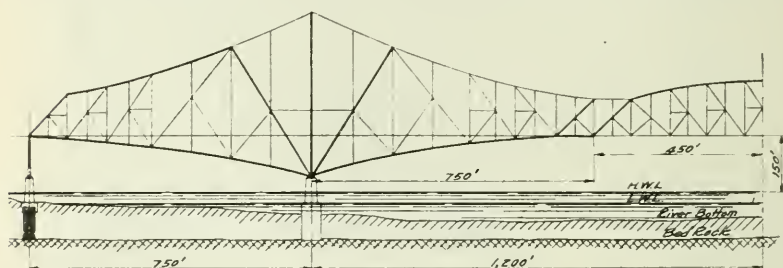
Layout for 2,400-foot Span Cantilever Railway Bridge.
